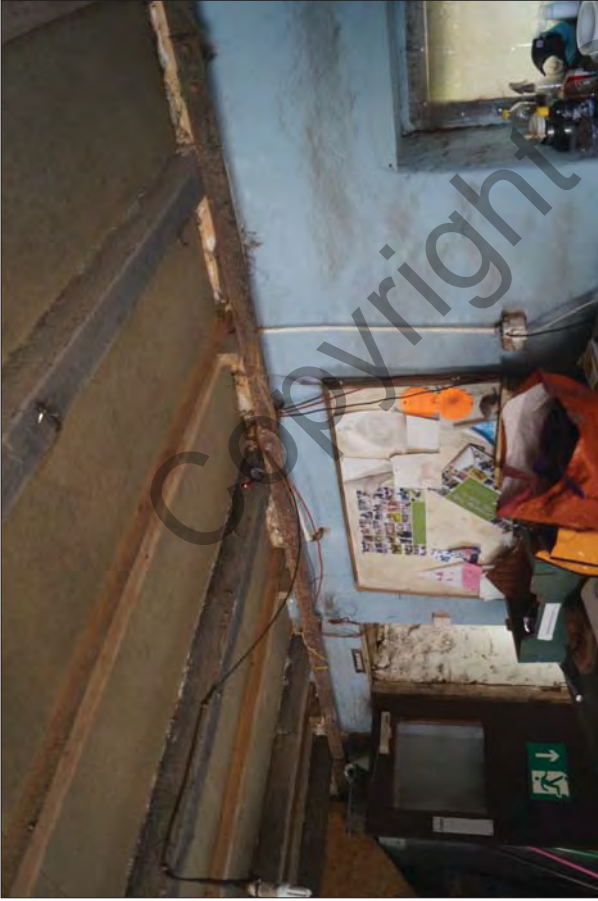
Interior of Building 5 - Barn. Showing Earlier Boundary Wall Incorporated into Structure
